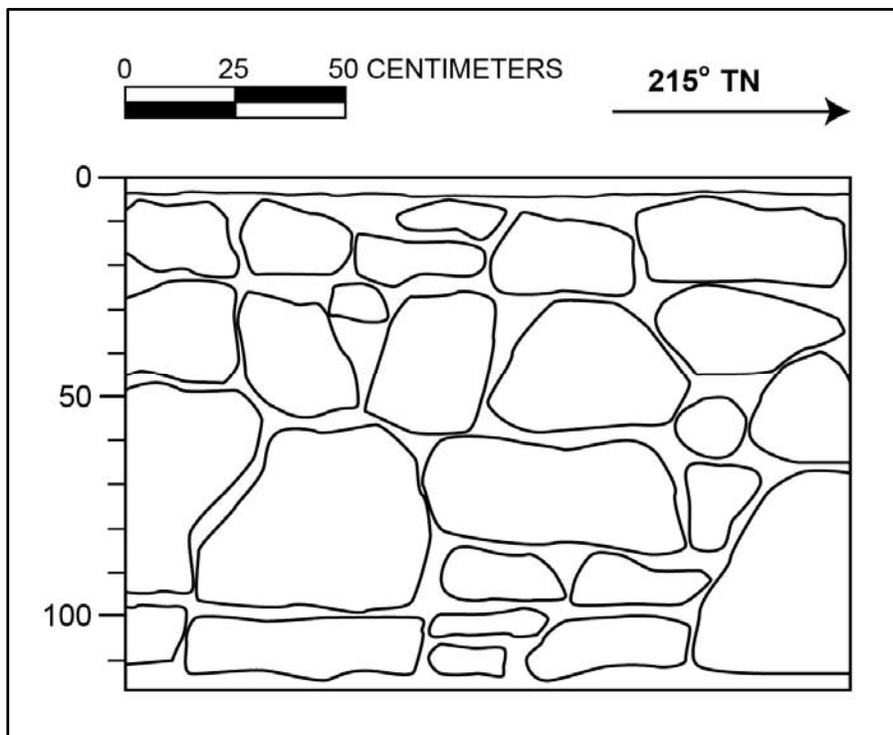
Profile of a portion of the retaining wall, SIHP # -2281
